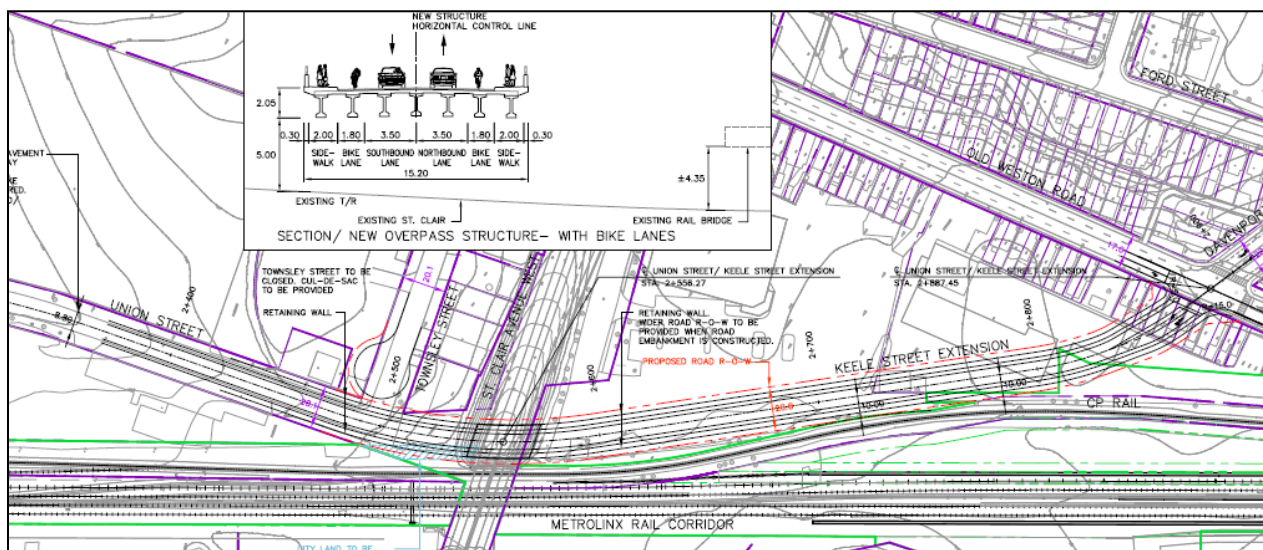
Option 5(2/2) - Union Street Crossing over St. Clair Avenue West to connect with Davenport Road
